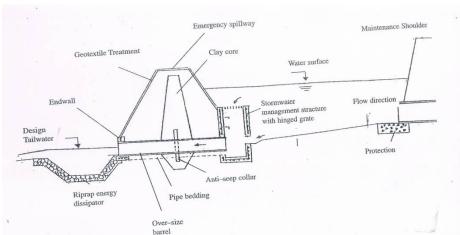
Sectional View of Detention Basin (Source:Hydraulic Structures -Design and Construction Hand book-By Mays, Mc.Graw Hill,1999)
